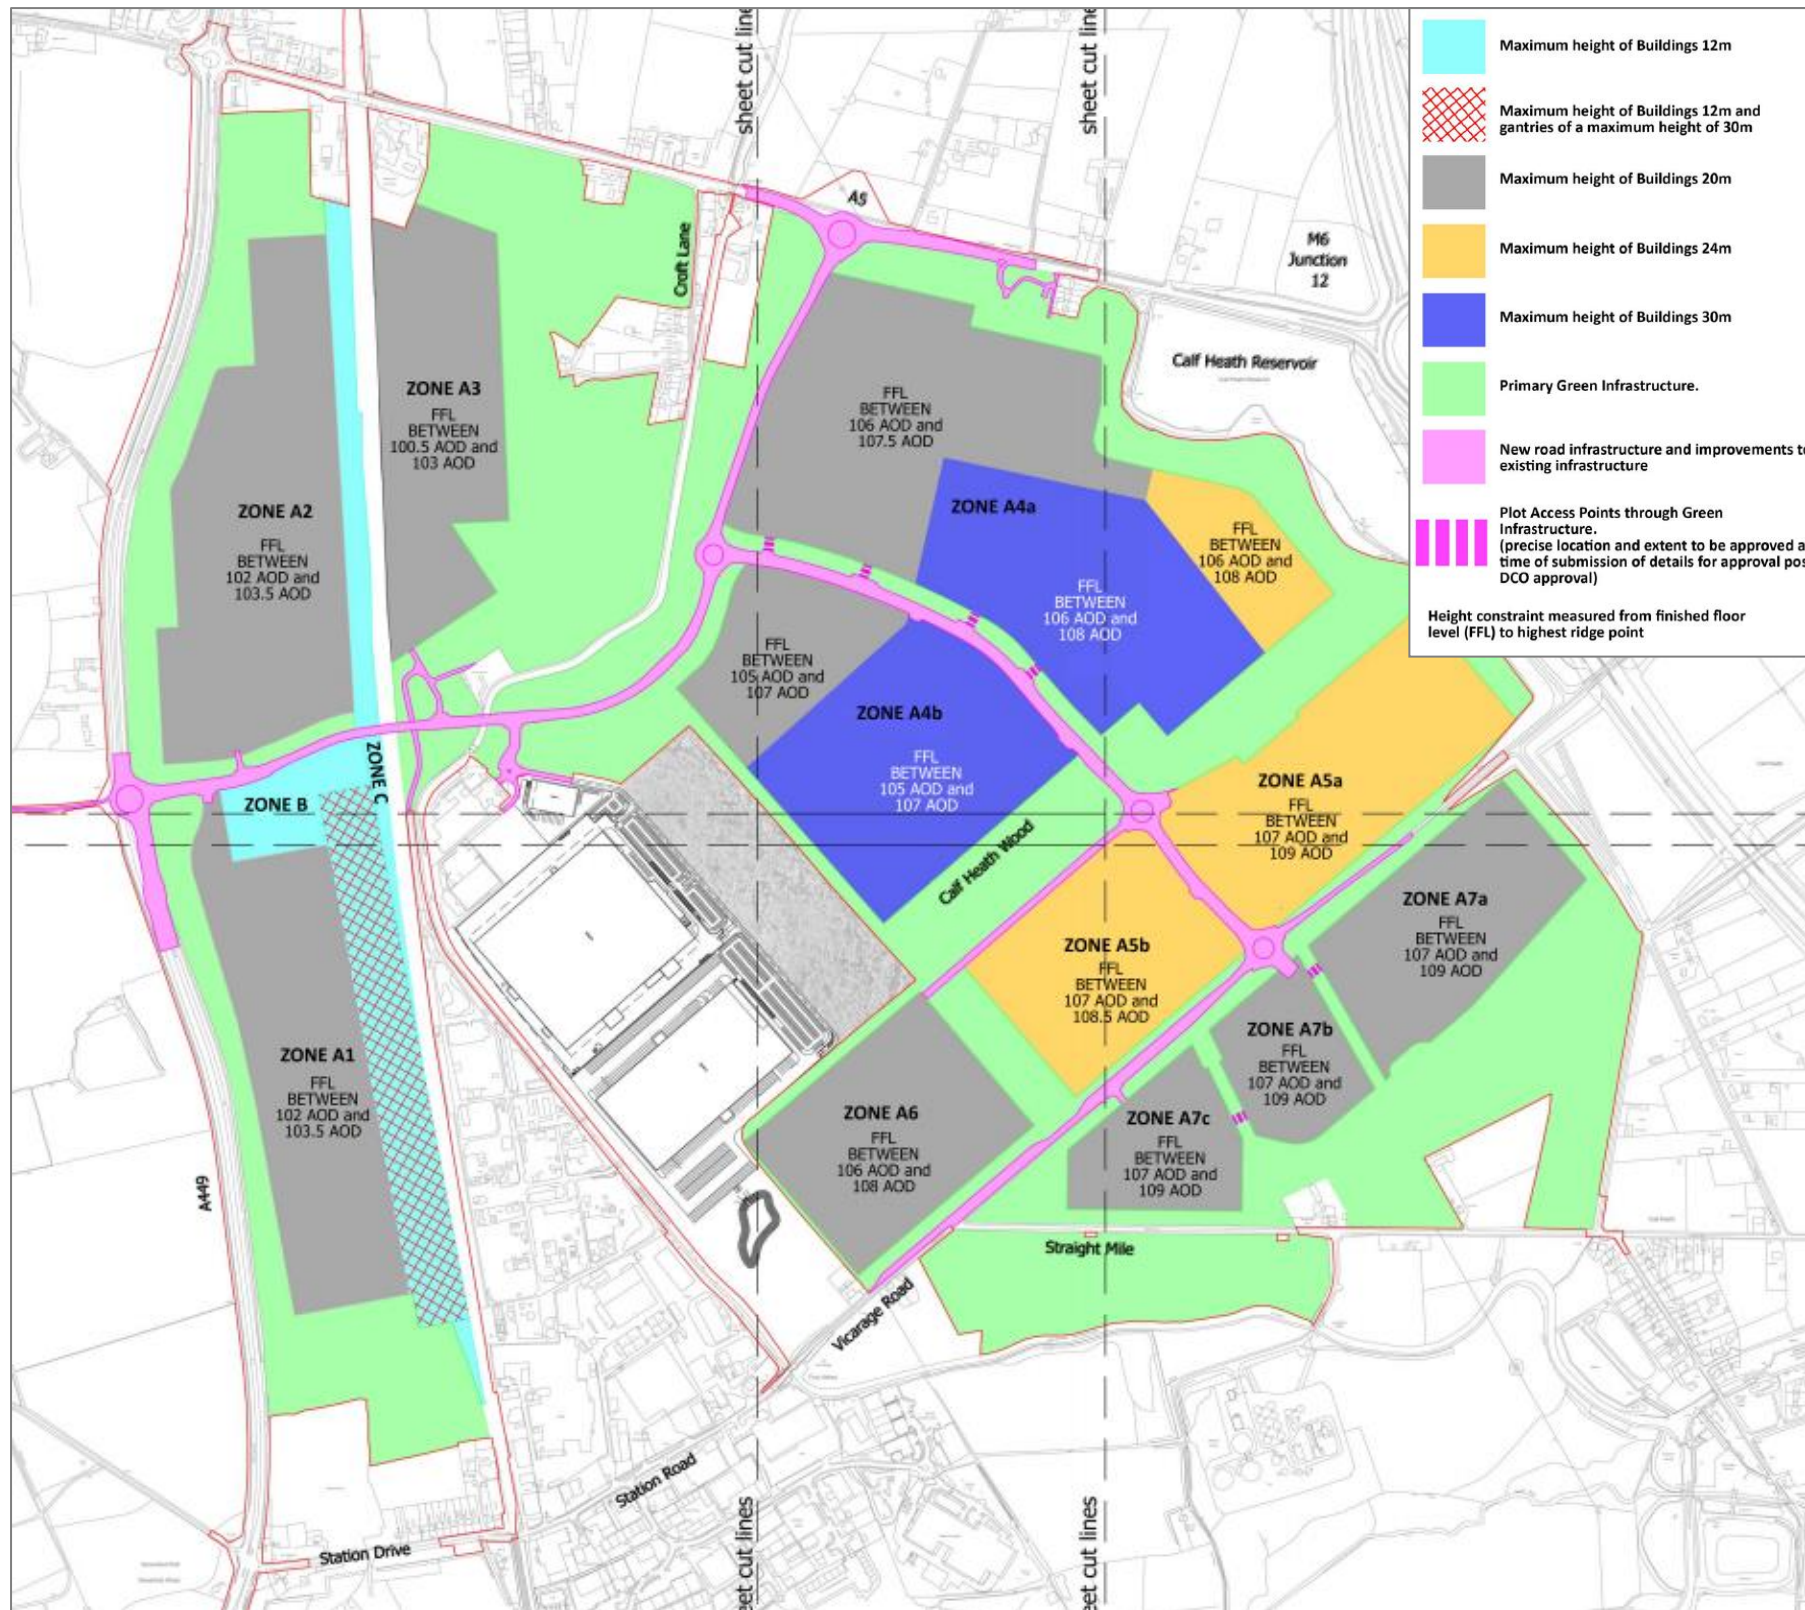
Floor Level and Building Heights Parameter Plan [Document 2.6]
